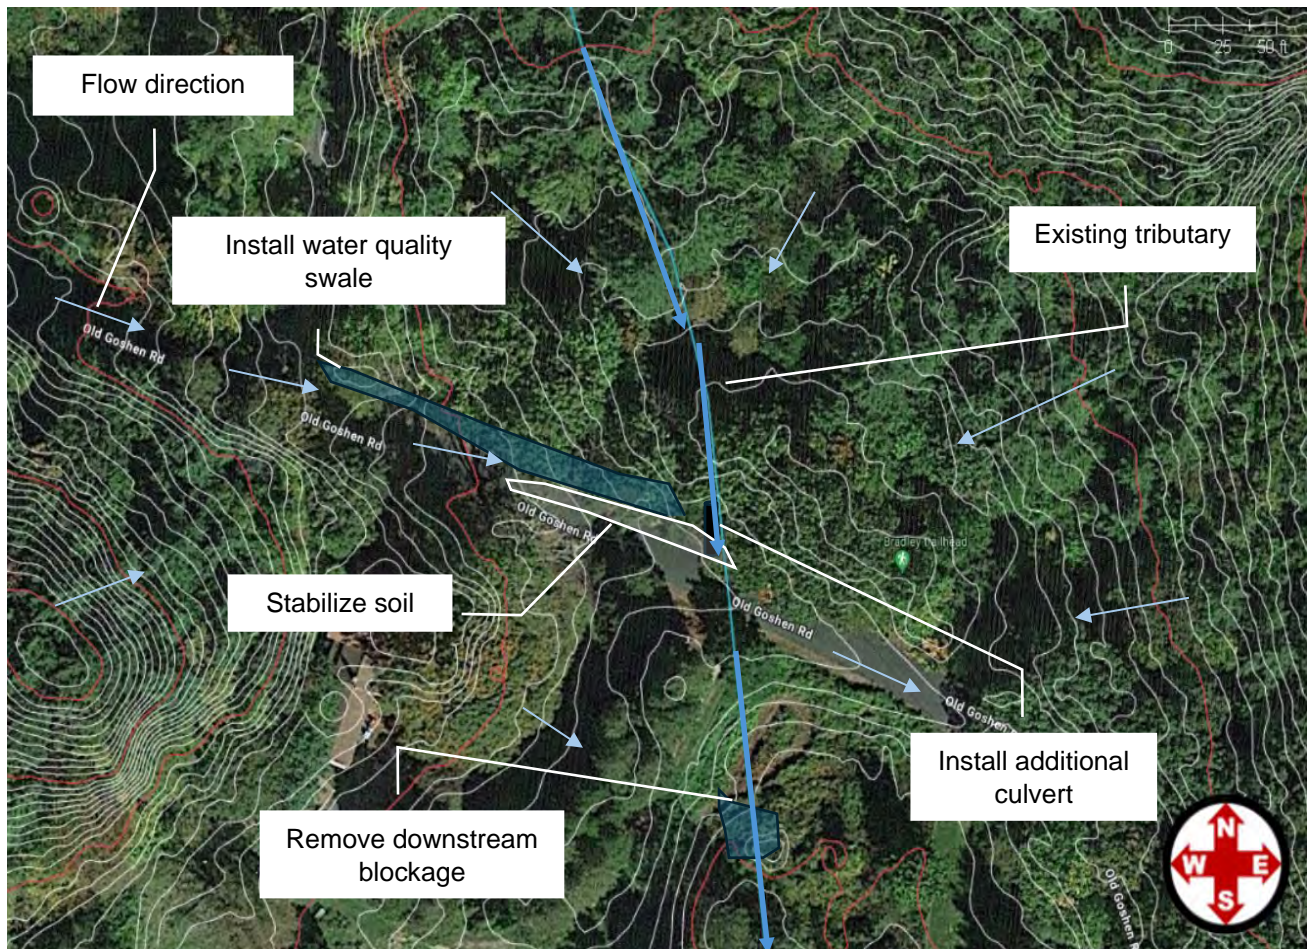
Topography and proposed water quality swale on Old Goshen Road
